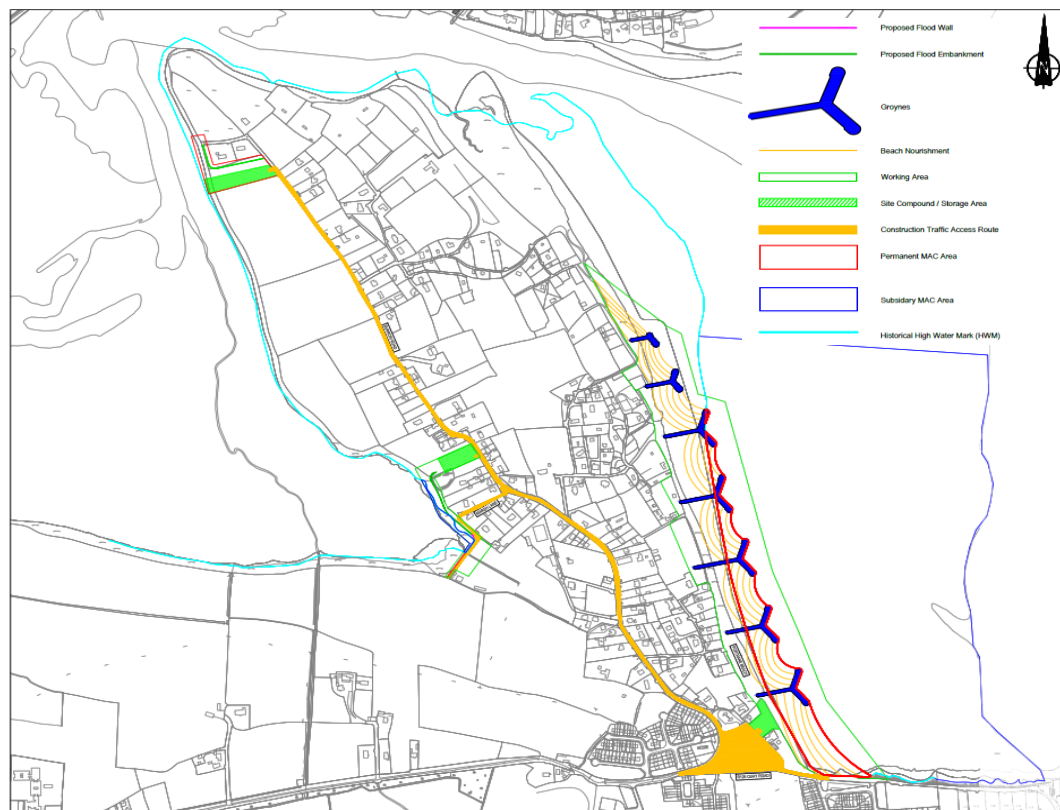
Applicant Plan -General Layout of Fishtail Groyne Structures
